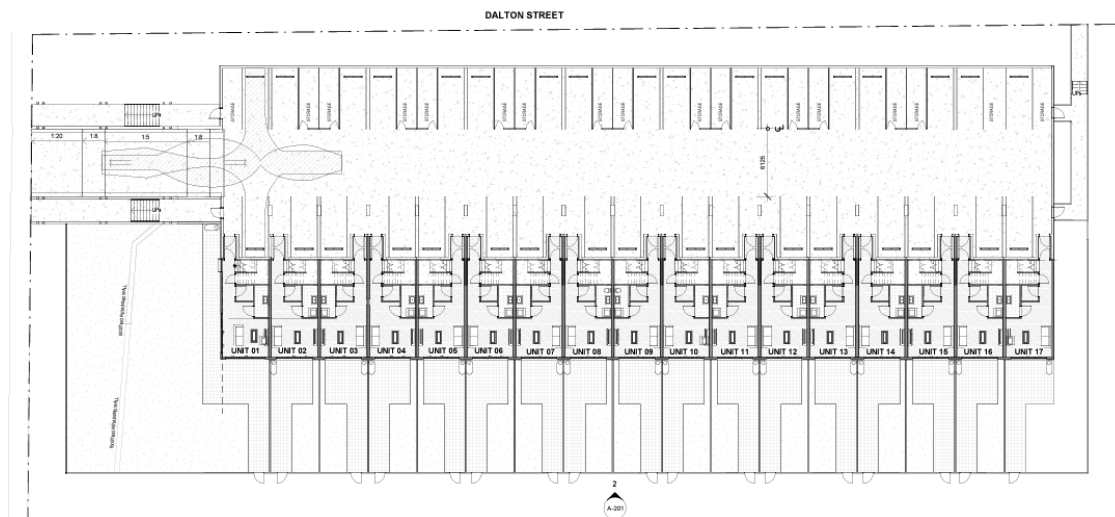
Floor Plan (Excerpt) - Basement and Ground Floor
